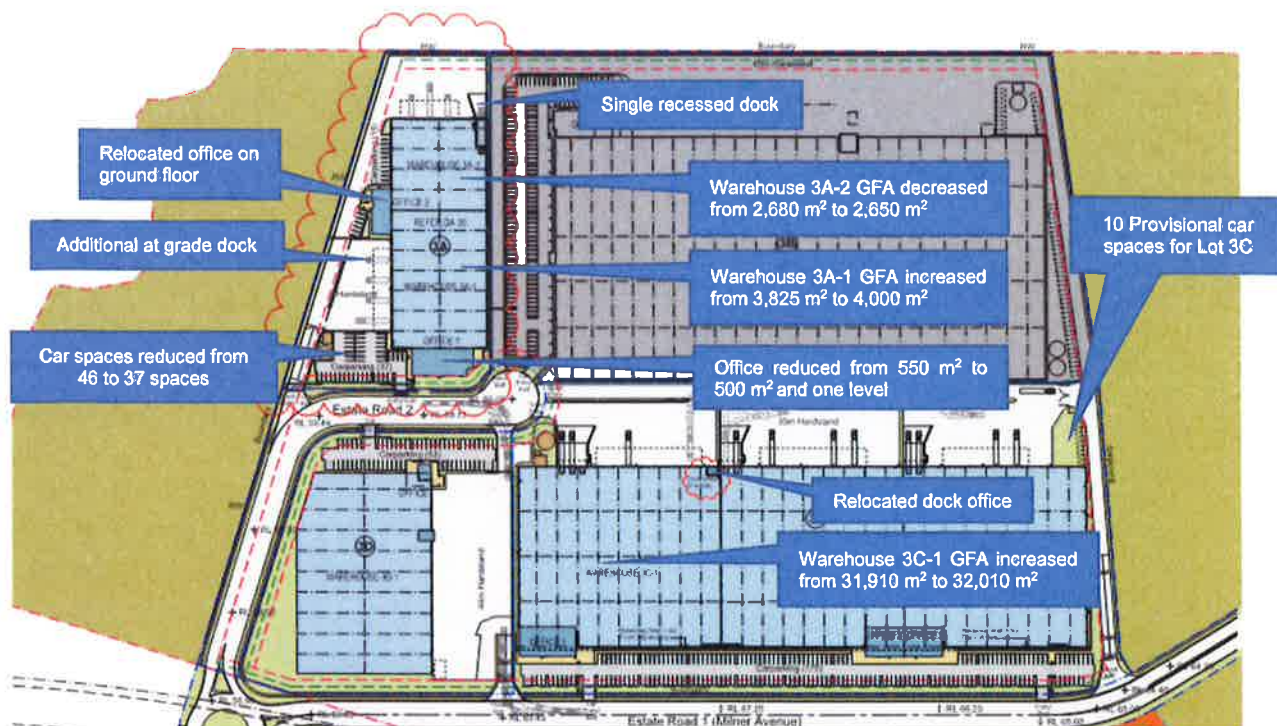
Proposed Layout of the SSD 6078 Modification Application
